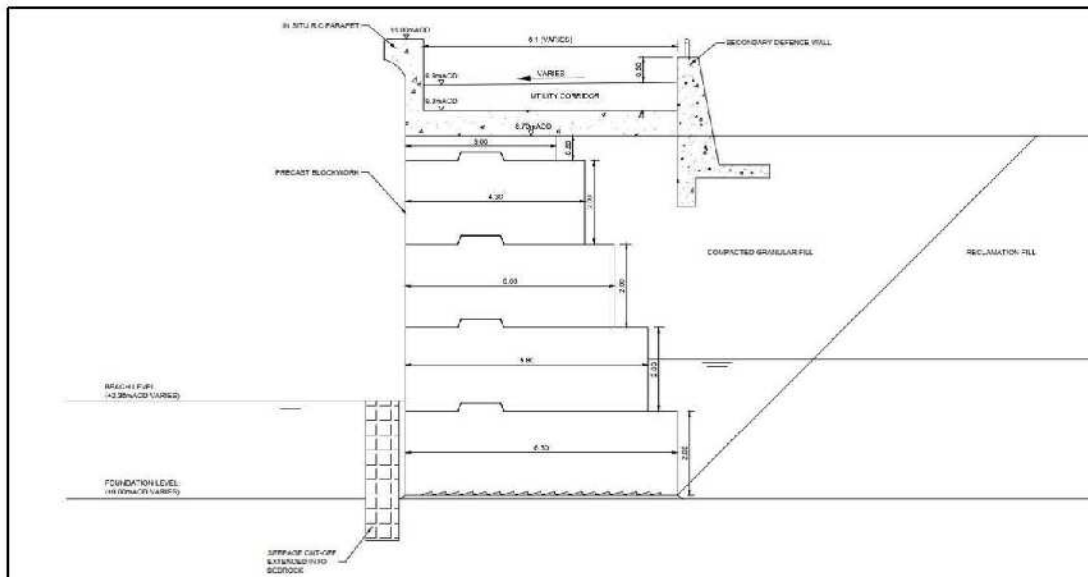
Indicative Blockwork Quay Wall Geometry
